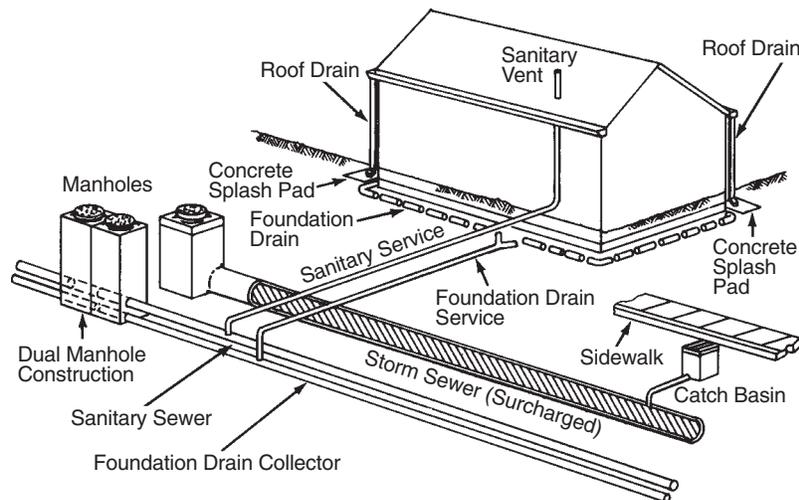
Foundation drain connected to foundation drain collector by gravity
